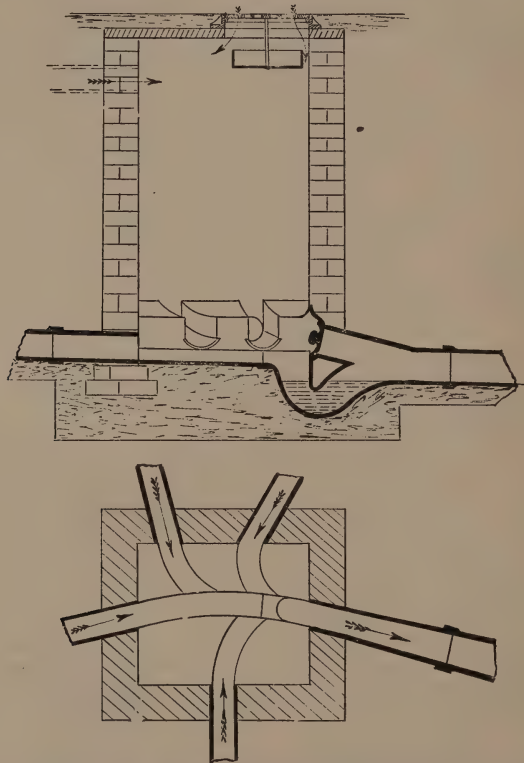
Elevation and plan of Manhole, showing open channel and the trap disconnecting house drain from sewer.
